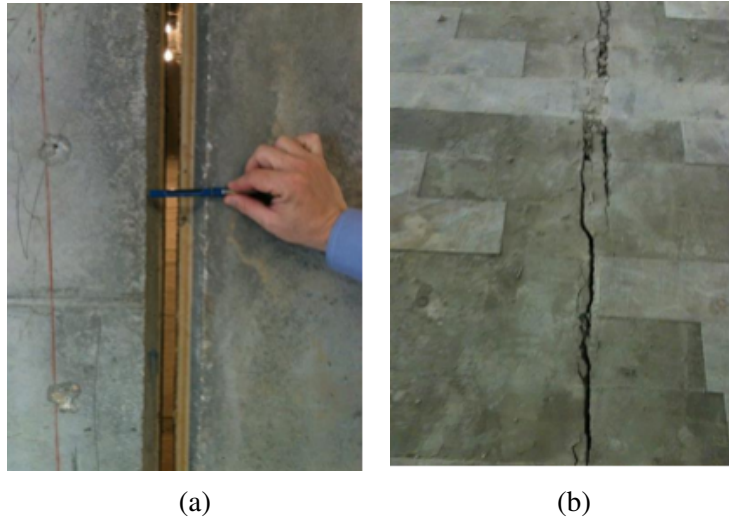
Observed Structural distress in the building (a) dislocation on wall (b) cracks on Floor. "Reprinted with permission from Elsevier".
